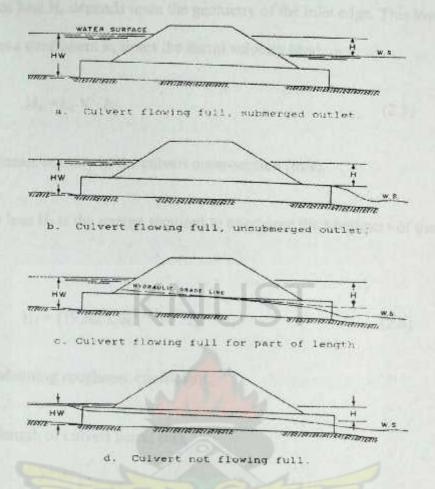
Flow Profiles for culvert in Outlet Control
